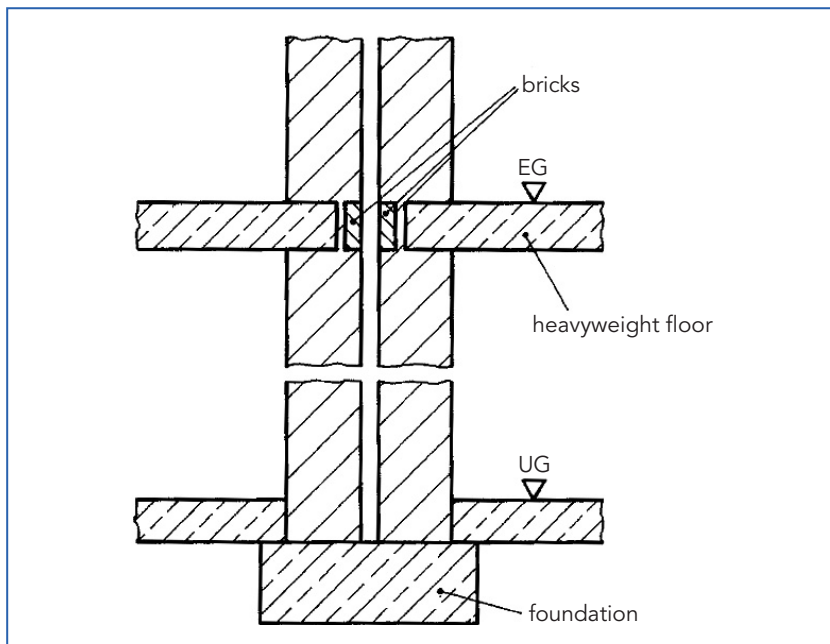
Detail of the cavity in a cavity wall construction according to DIN 4109-89, Beiblatt 1. [2]
